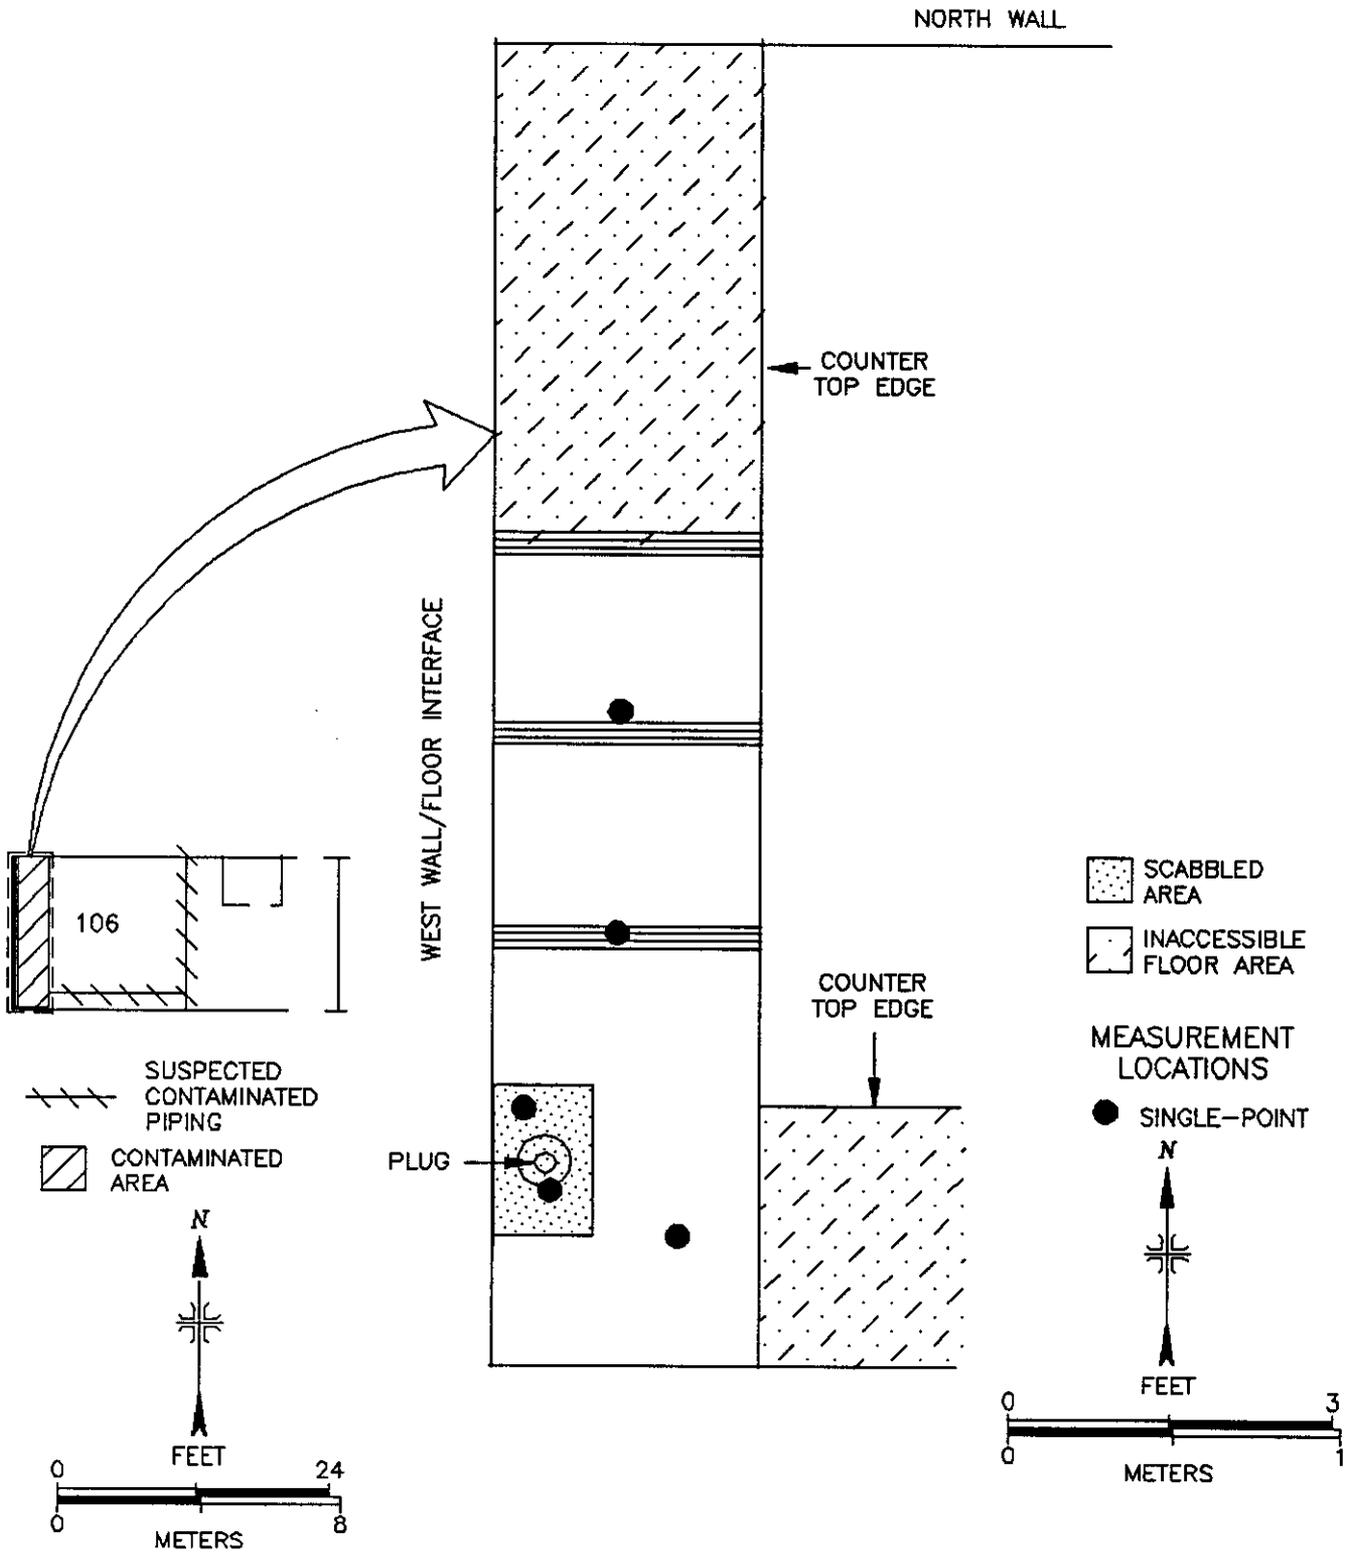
Building 29, Room 106, Indicating Measurement Locations on the Floor Beneath Counters
